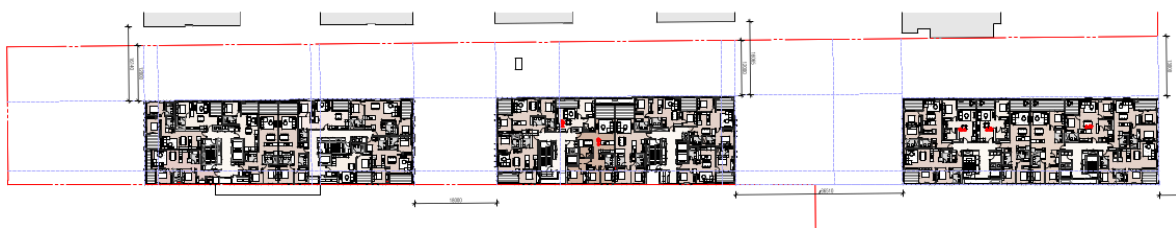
Buildings A, B and C Precinct Plan - First Floor
